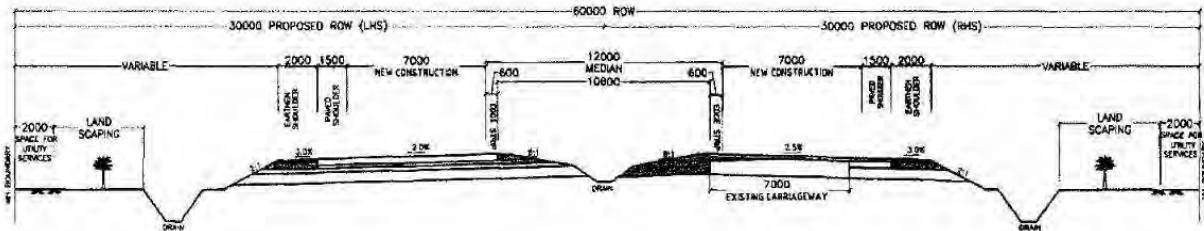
Typical Cross Section for left side widening without service road (TCS-3)
